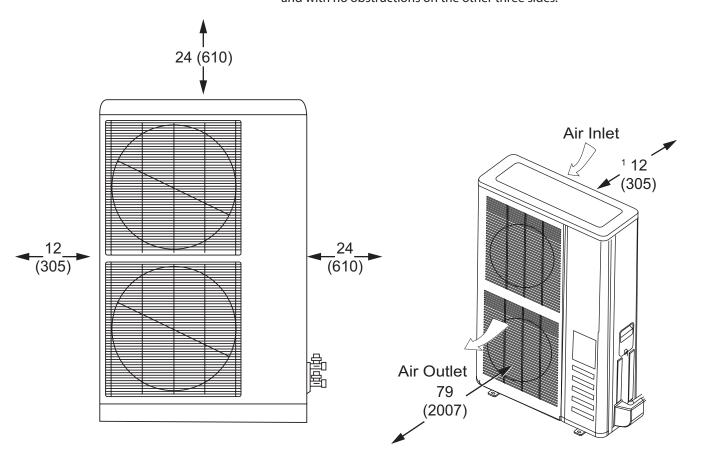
Multi-Zone Outdoor Unit Dimensions - Inches (mm)
